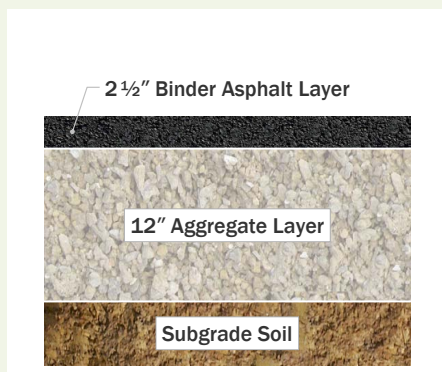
First-stage asphalt pavement used at the start of a subdivision project
